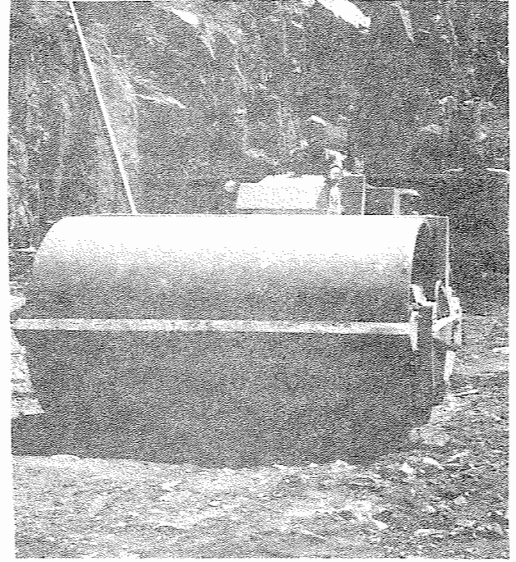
Compaction of backfill material prior to next reinforcing element layout.
